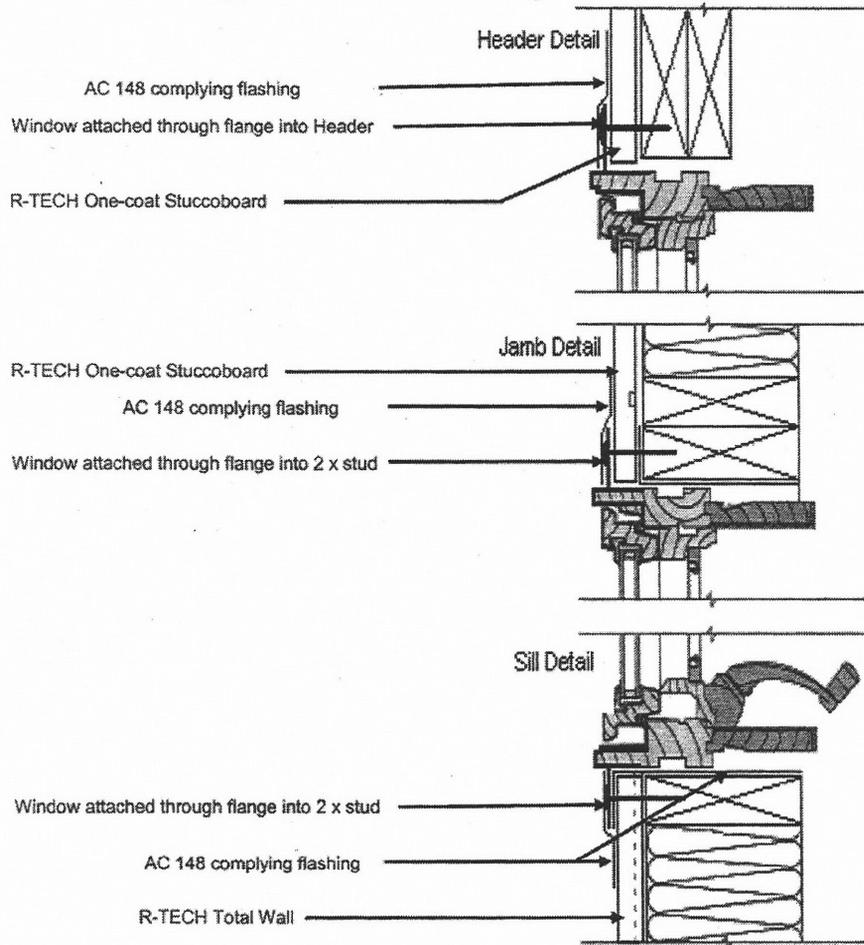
INSTALLATION DETAILS FOR R-TECH ONE-COAT STUCCO BOARD INSULATION USED AS A WEATHER-RESISTIVE BARRIER (Continued)
